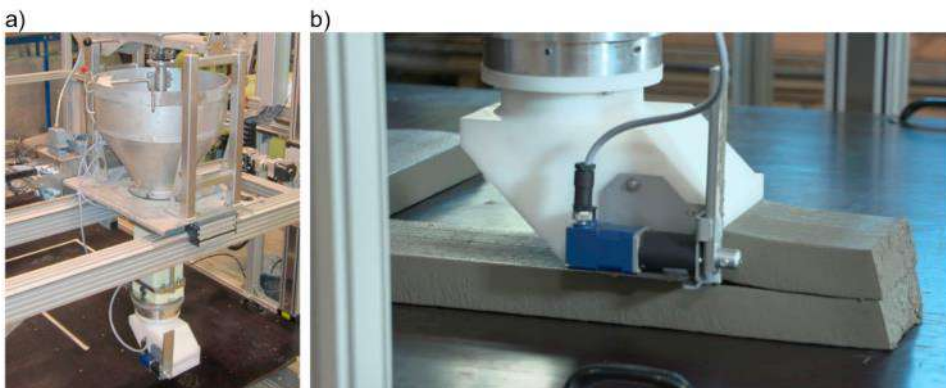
FDM technology for 3D printing with extrusion of filaments (TU Dresden): a) the printhead of CONPrint3D printer, b) view of the nozzle with extruded filaments [6]
